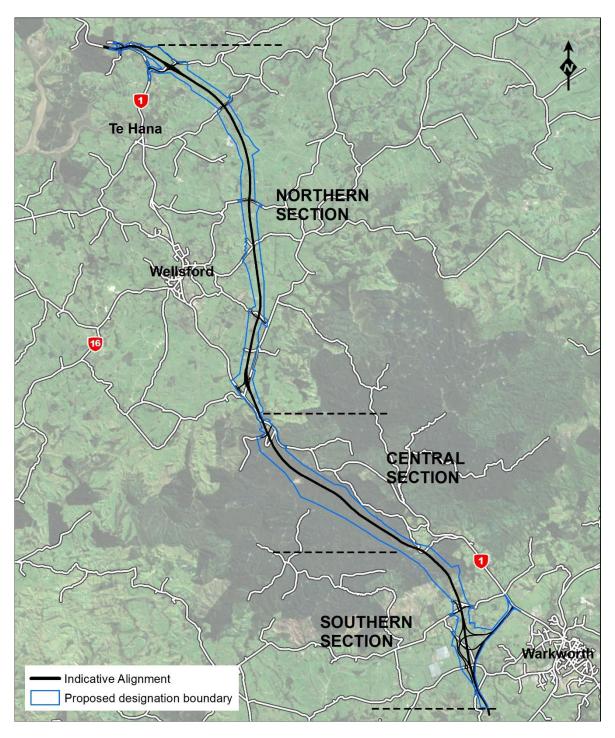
Northern, Central, and Southern Sections for Construction Assessment
